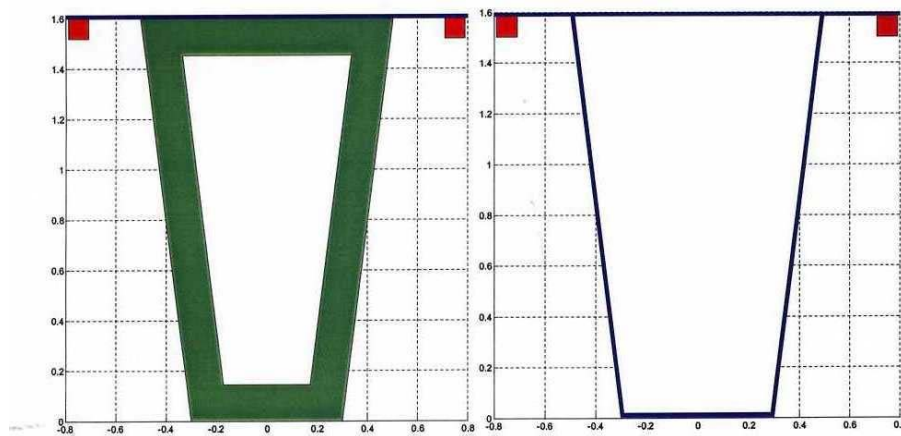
Guideway Beam Designs: Hybrid (Left) and Steel (Right)
